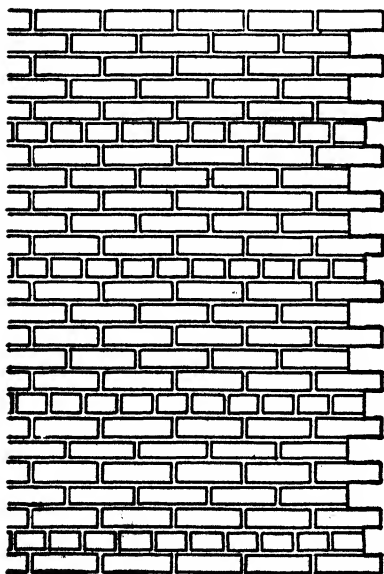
Toothing as shown here should be avoided except where necessary in bonding new work to old.
